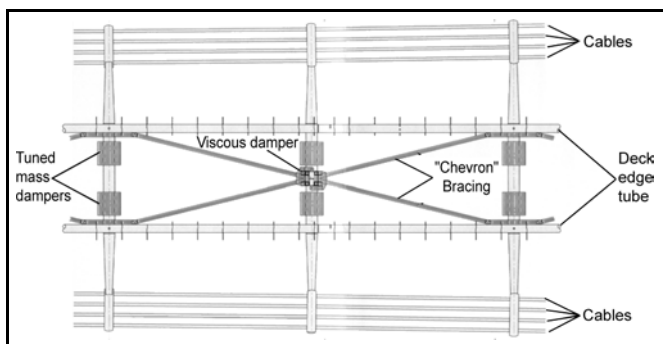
Plan view of underside of deck showing installation of dampers (from Fitzpatrick et al, 2001).
